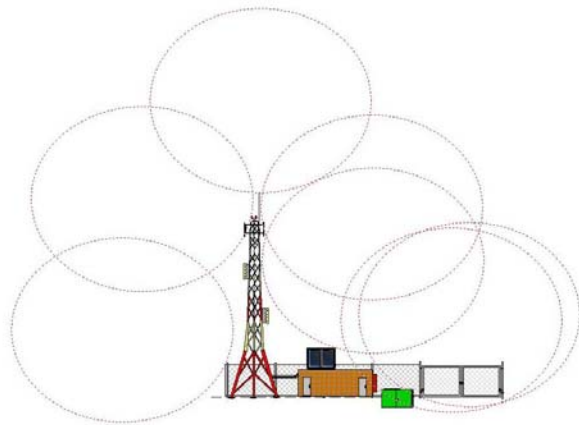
Sketch of a cell / Microwave site where the photovoltaic panels may need lightning protection because the distance from the tower may place the panels outside the arc of a 150 foot Radius ball and therefore outside the Zone of protection afforded by the tower.
